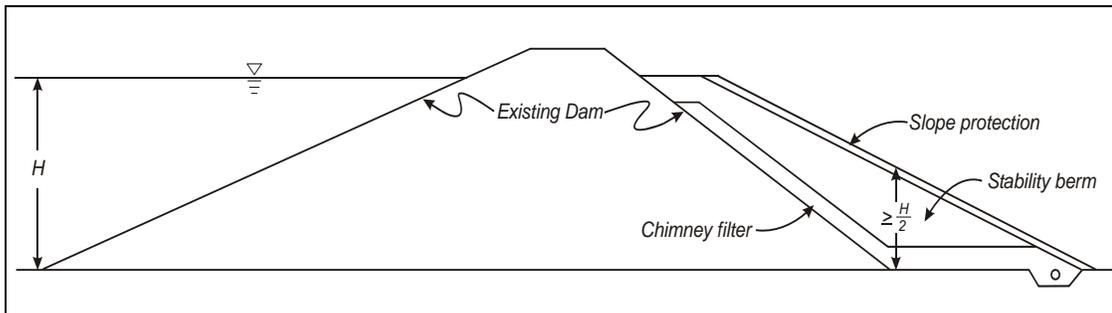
Simple cross section showing a chimney added to an existing dam.
